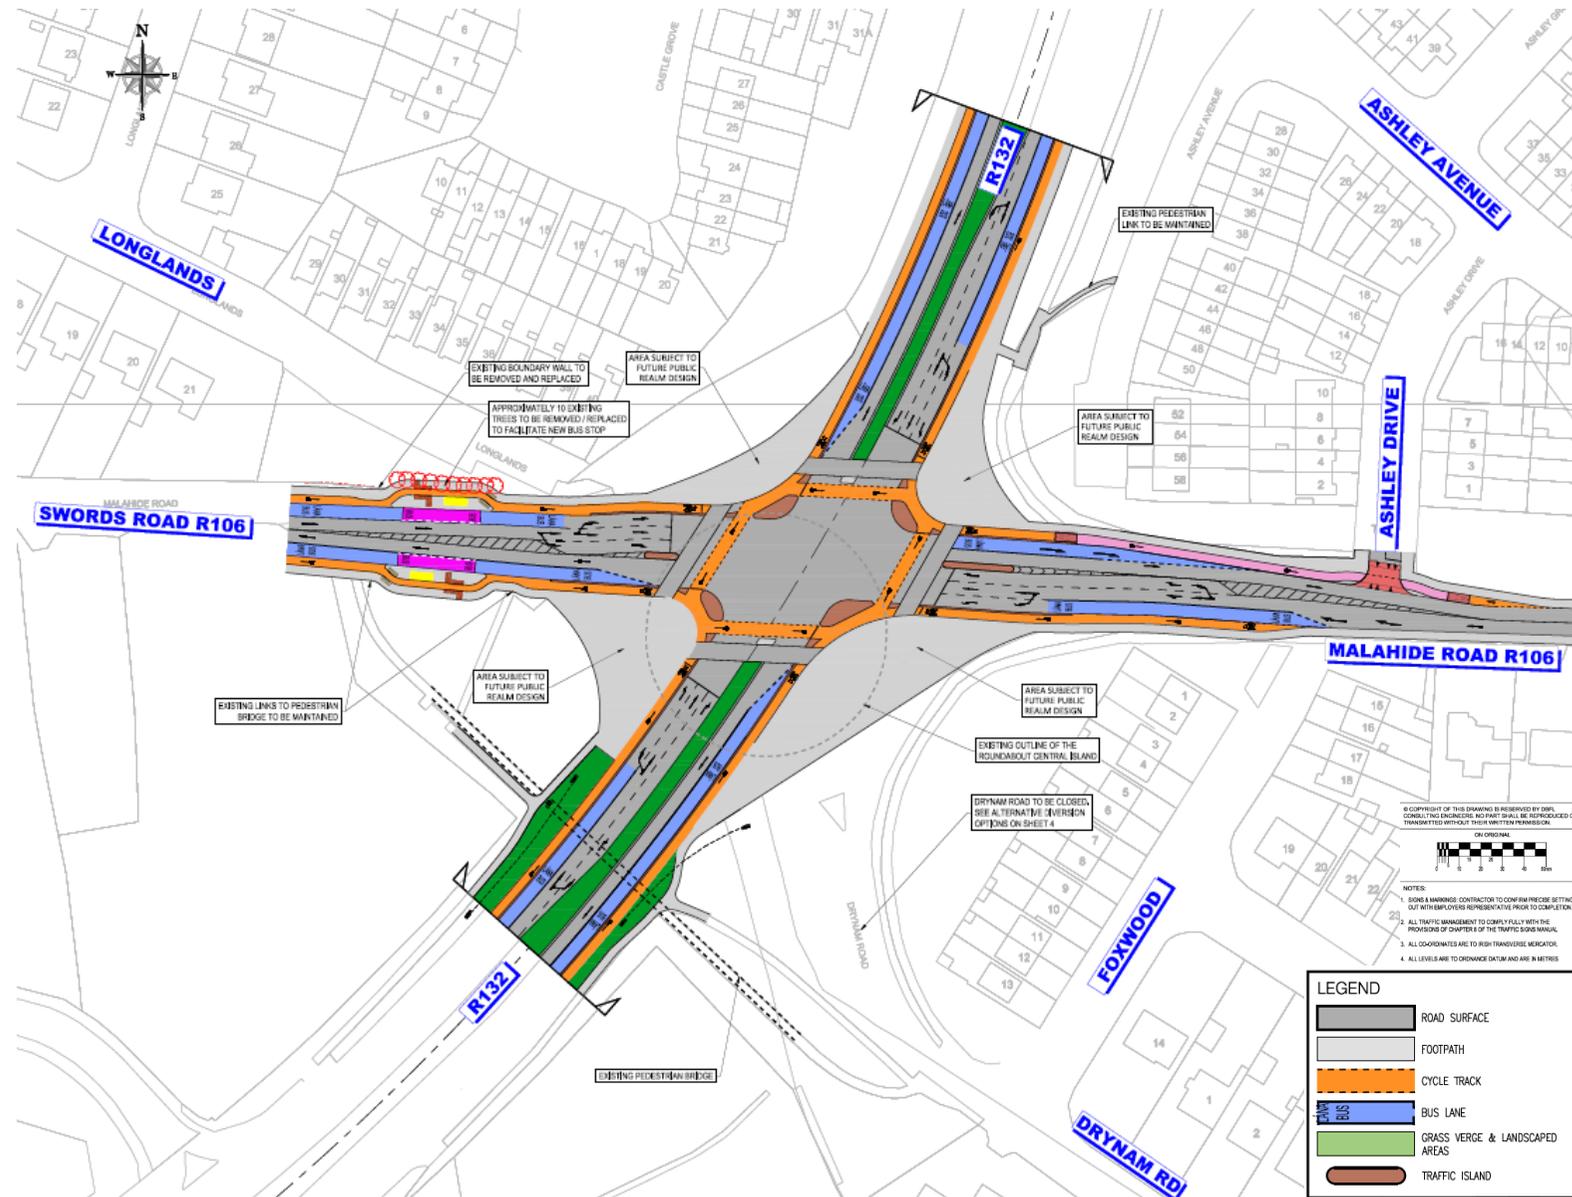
Proposed design at Malahide Roundabout<sup>4</sup>
